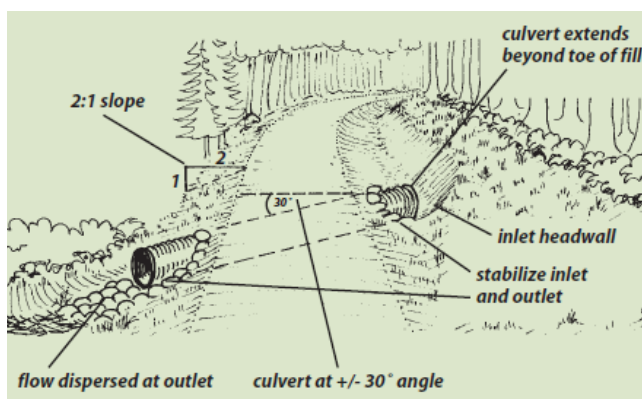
Design & installation of pipe culverts (ME BMPs Top & VT AMPs Right).
